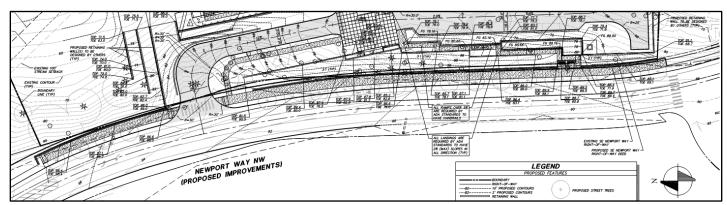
Newport Way Frontage Improvements showing a 10-foot bike-pedestrian facility and 5-ft. tree planter strip
